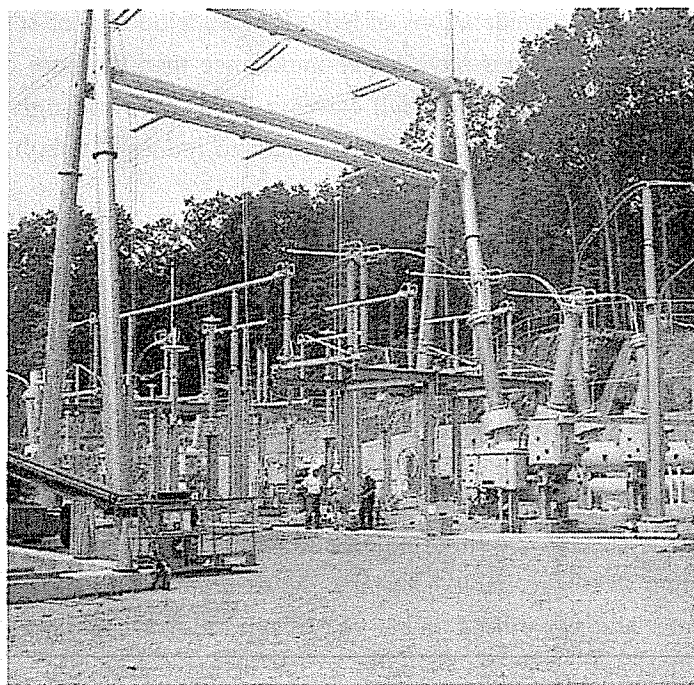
Archer's Lane 345-kV Transition Station (Under Construction)
